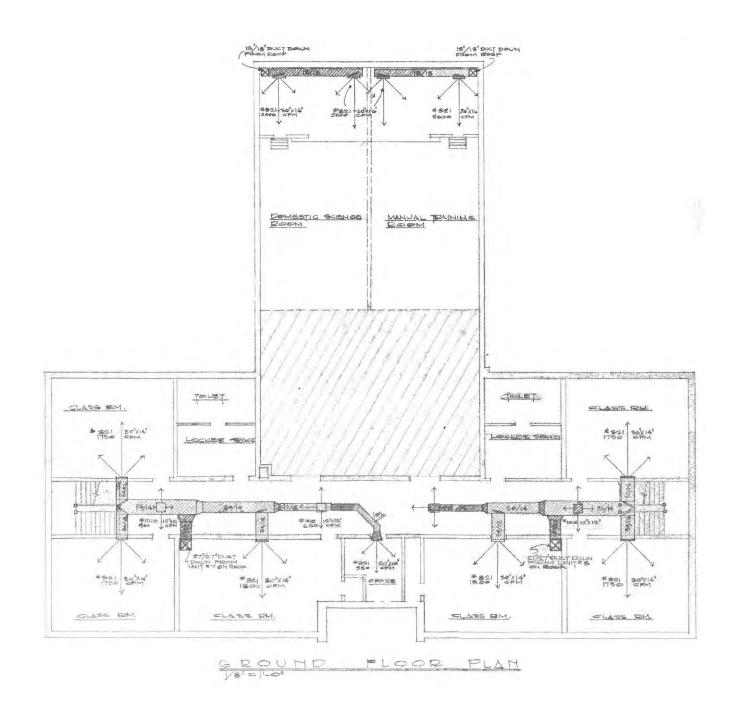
Ground Floor Plan, c.1950s Ductwork Project
